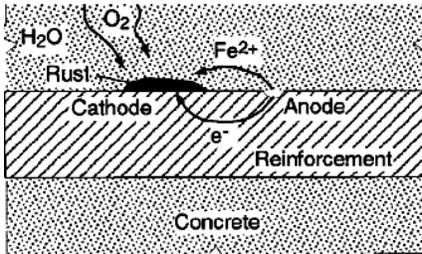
Corrosion of steel in concrete (Carino, 1999)
